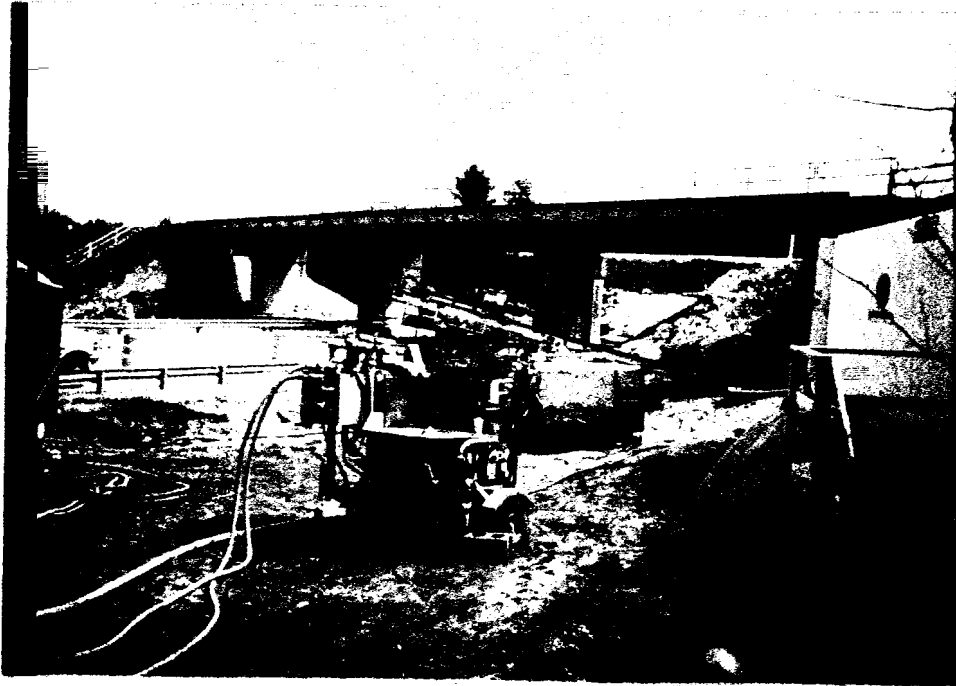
View (facing northeast) of existing railroad bridge during initial clearing operations for soil-nail wall, showing abutments and three center piers
